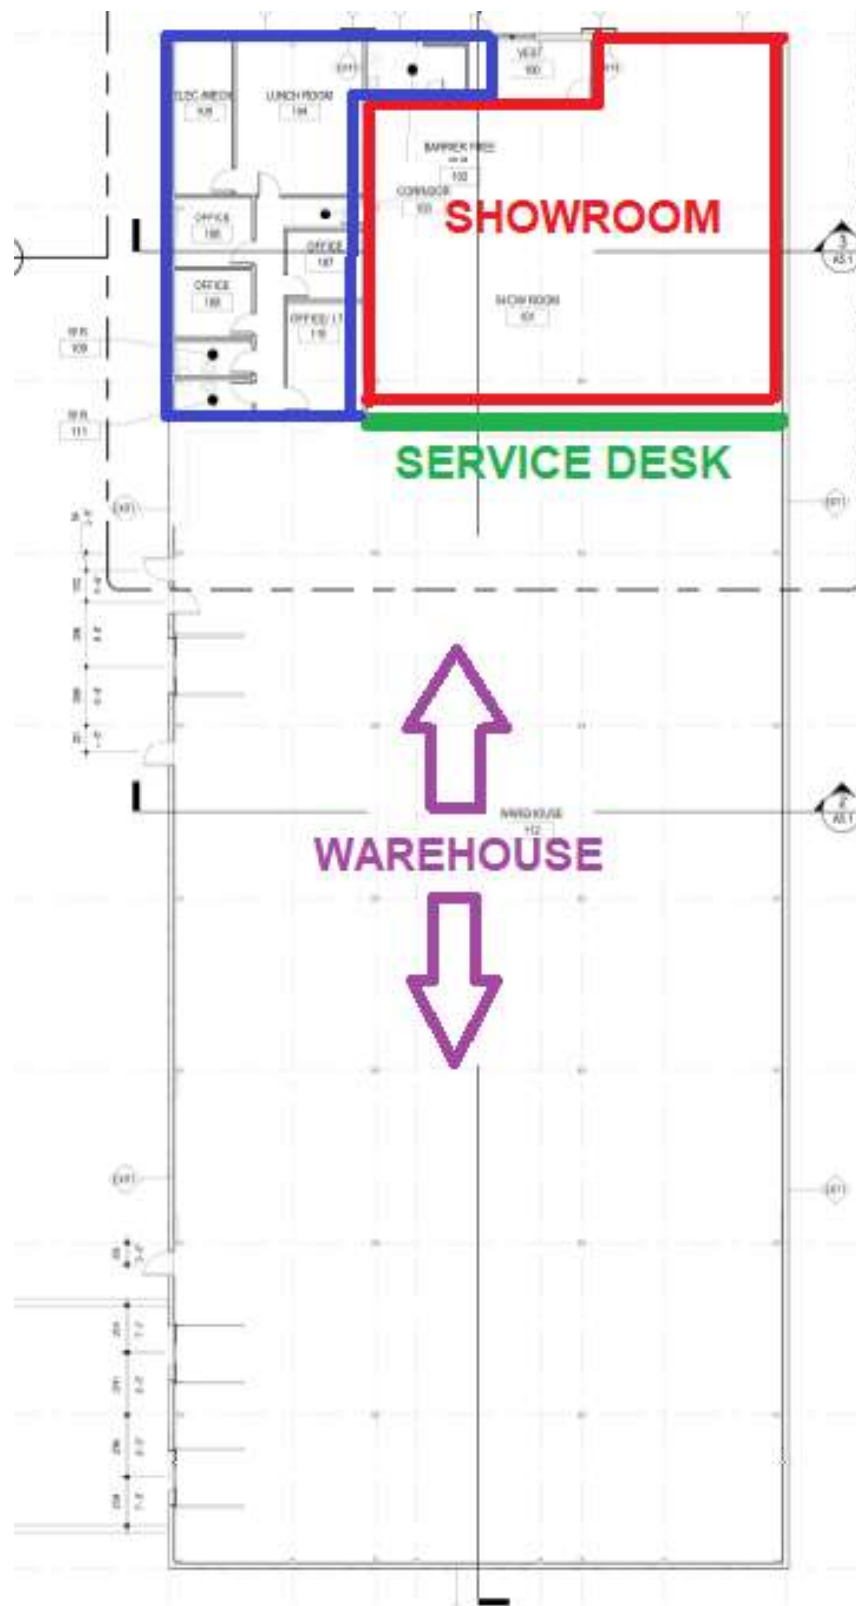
Exhibit B - Excerpt from Floor Plan of the Applicant's Proposed Building. Office area is outlined in blue; showroom area is outlined in red.
